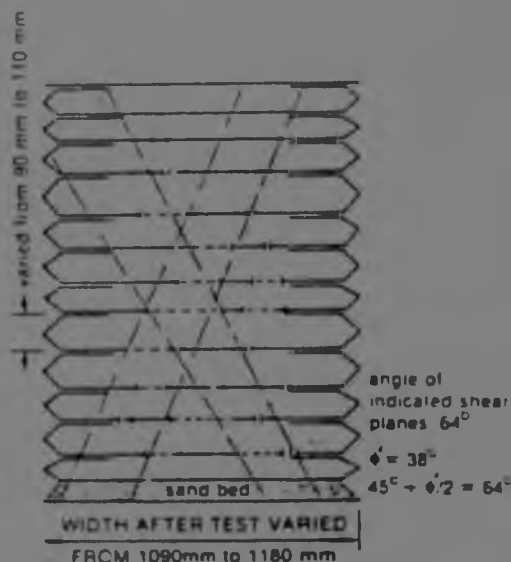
Positions of tensile failures in reinforcing of horizontally reinforced wall of granular material
